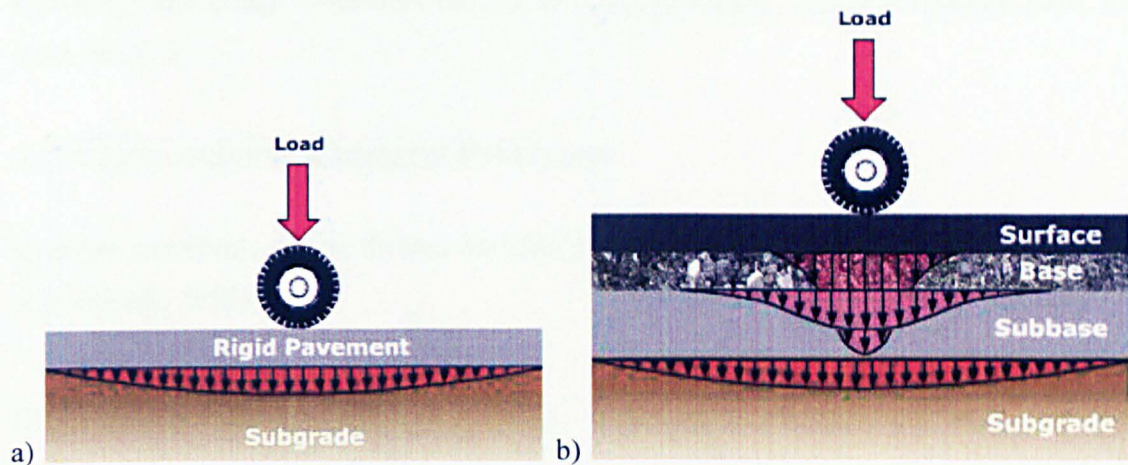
Load transfer to subgrade in a) concrete and b) asphalt pavements [ACPA, 2010b].
